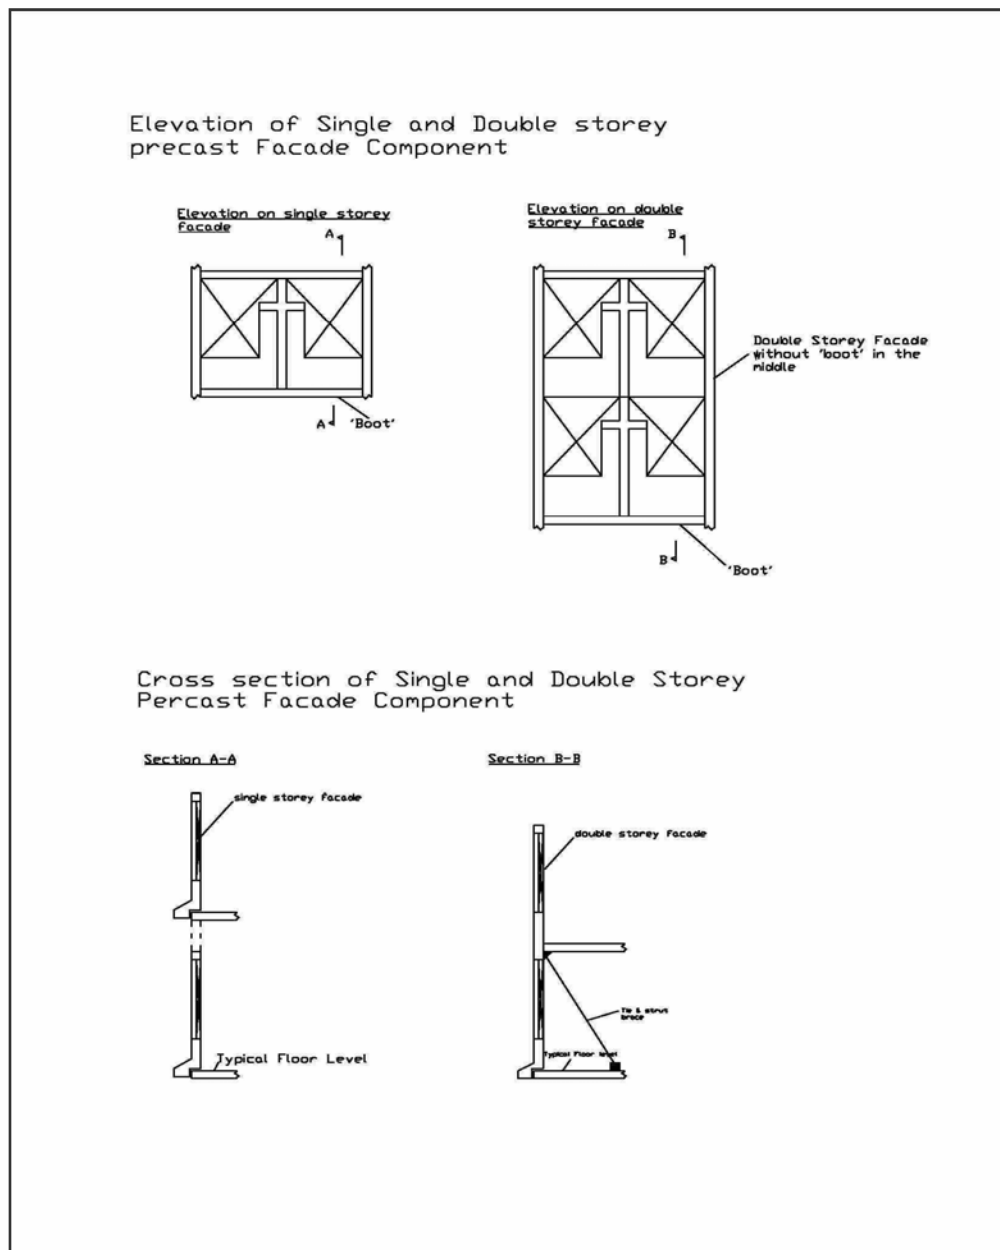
Details of Single Storey façade and Proposed Double Storey Façade
